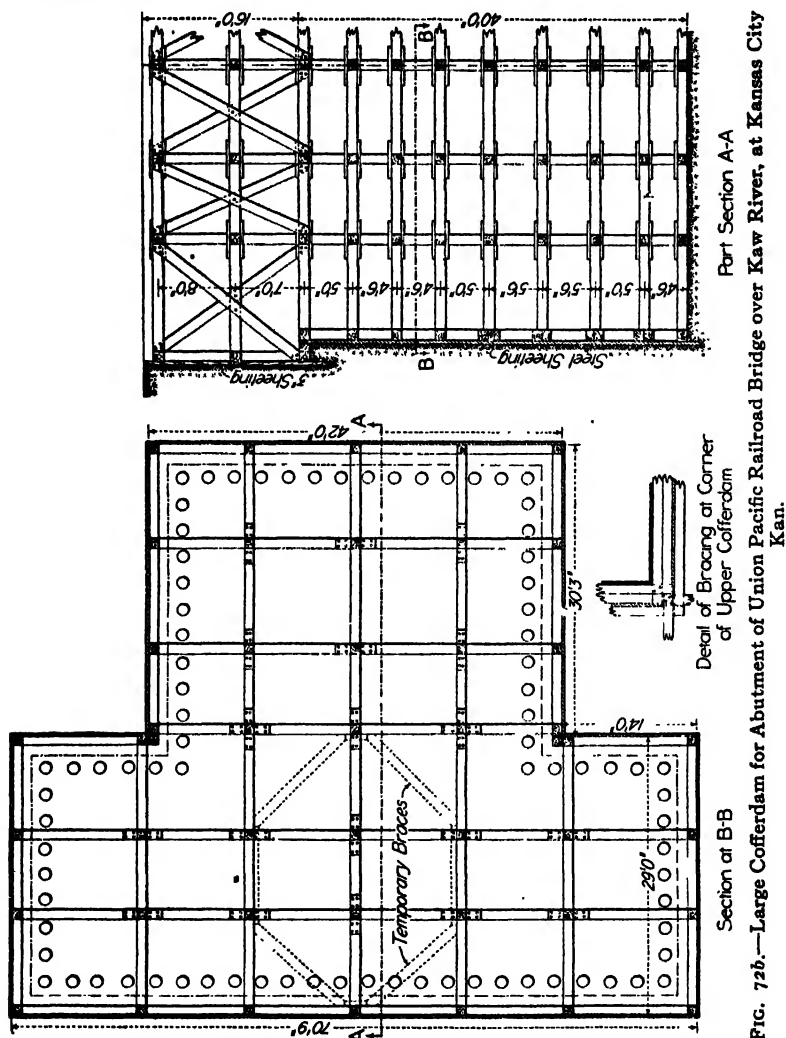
Large Cofferdam for Abutment of Union Pacific Railroad Bridge over Kaw River, at Kansas City Kan.
